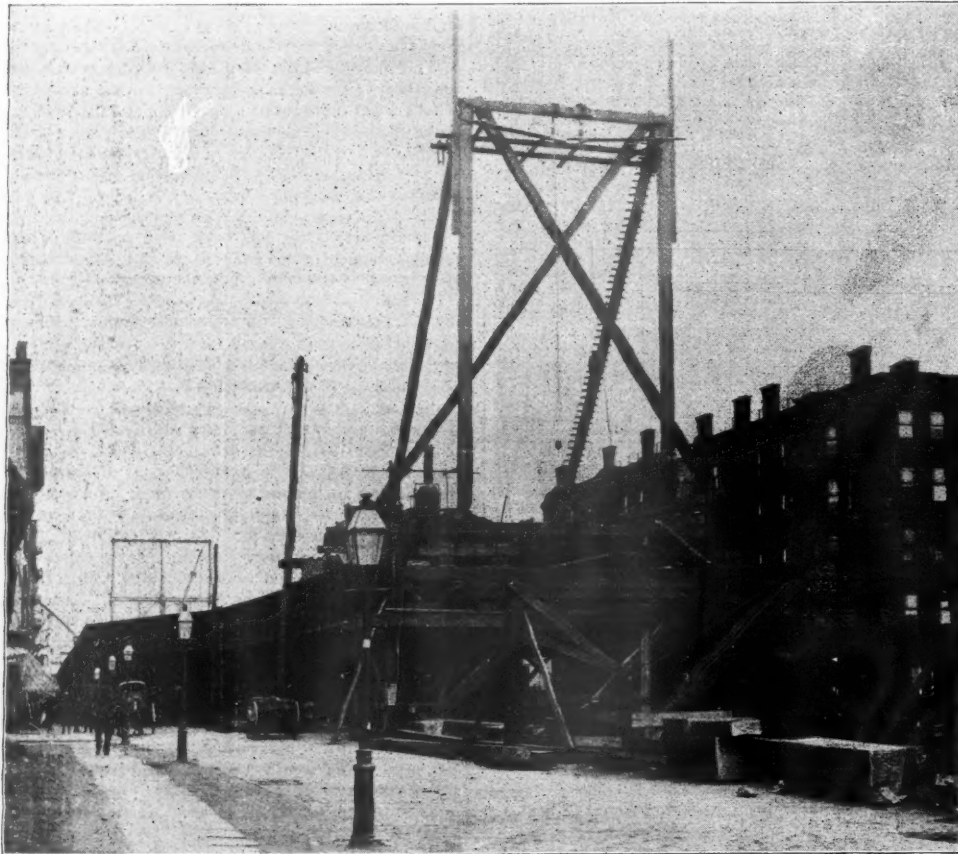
Looking North from 122d Street, Showing Widening of Structure for 125th Street Station.
